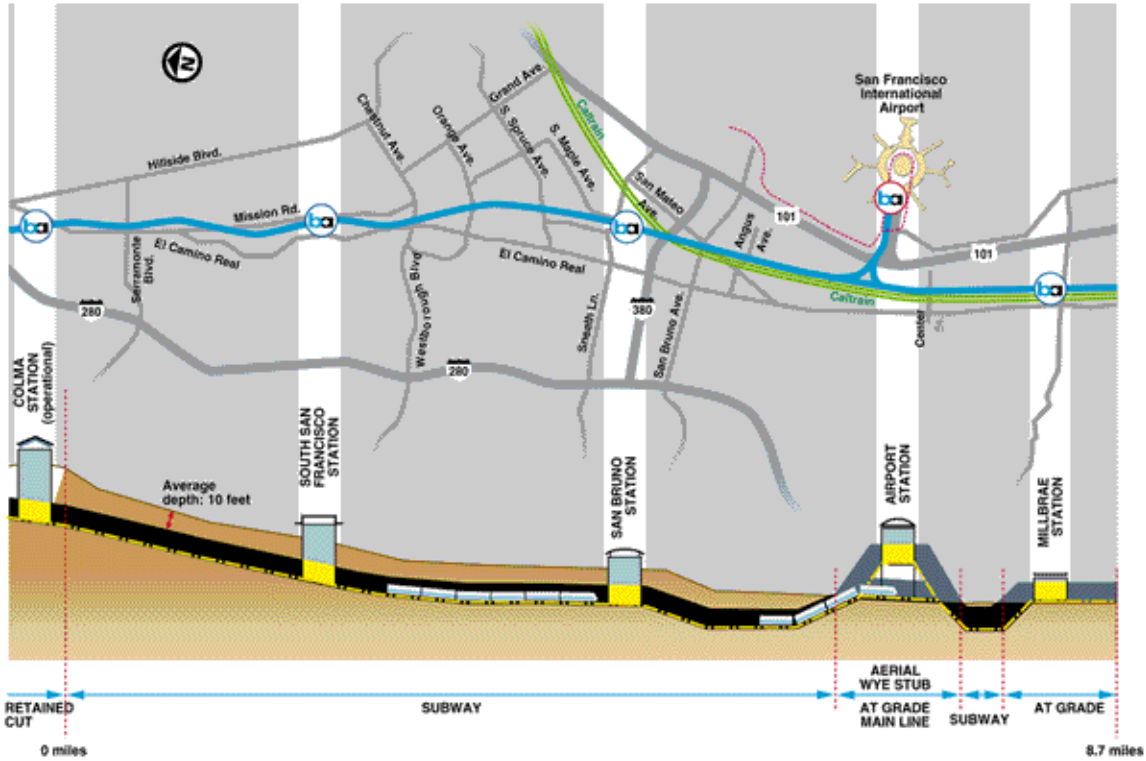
SFIA Extension Alignment and Elevation.⁴⁸
